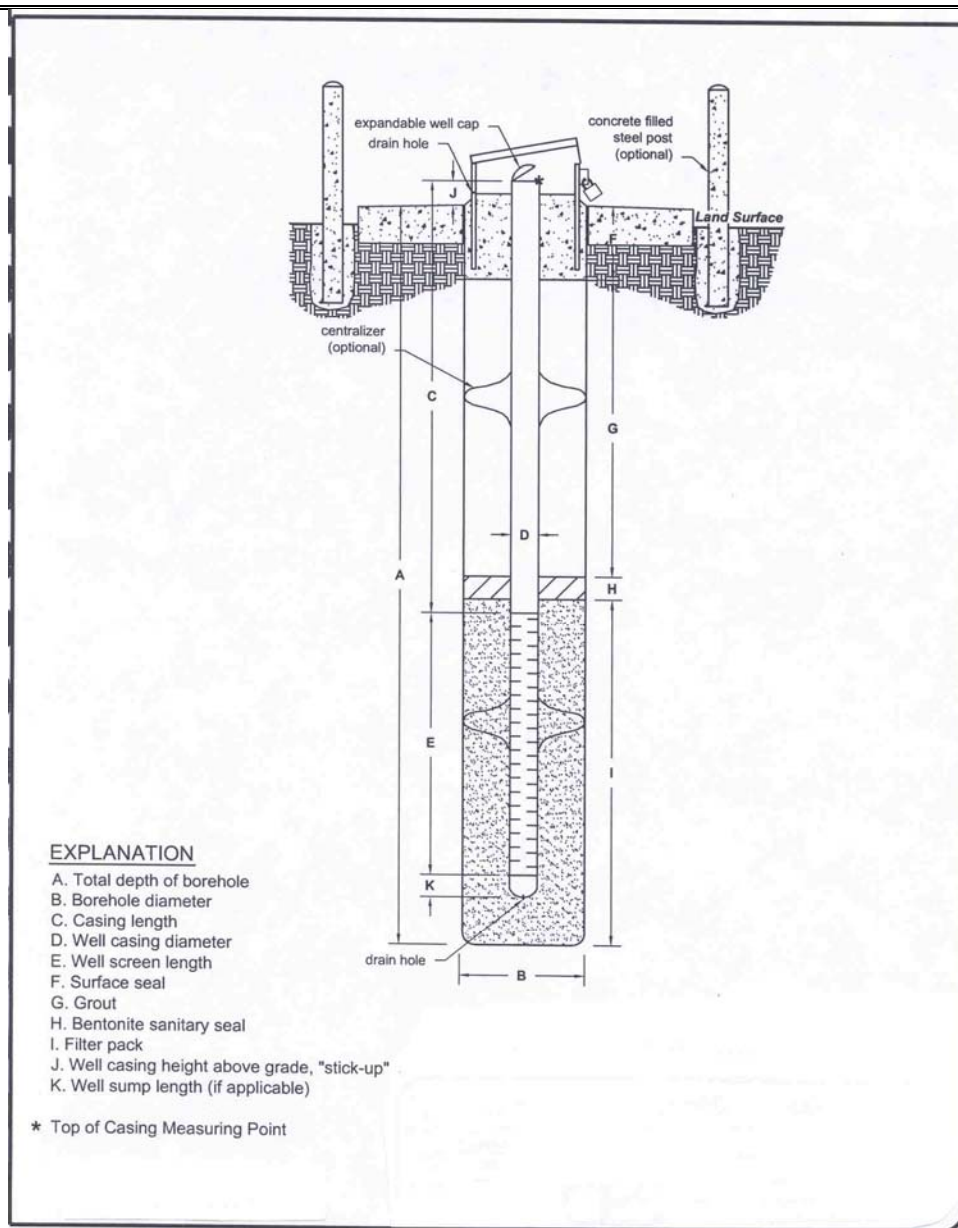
General monitoring well design for ground water sample collection at wastewater land application sites.⁵
